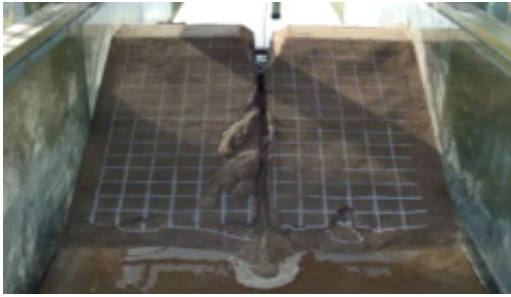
Overflow failure mechanism on levee ($H = 0.7 \text{ m}$)
